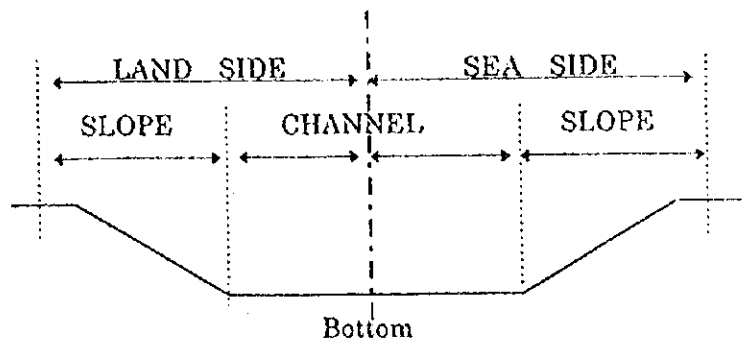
Division of the Cross Section of the Access Channel
